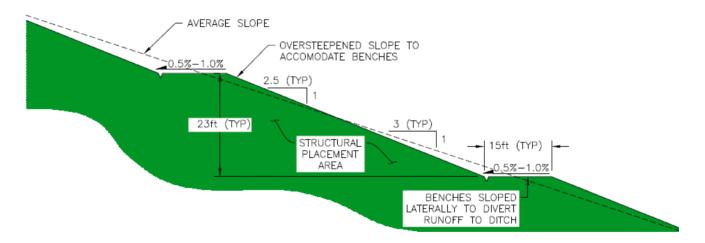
Schematic of Intermediate Benches on Downstream FTSF Slope
